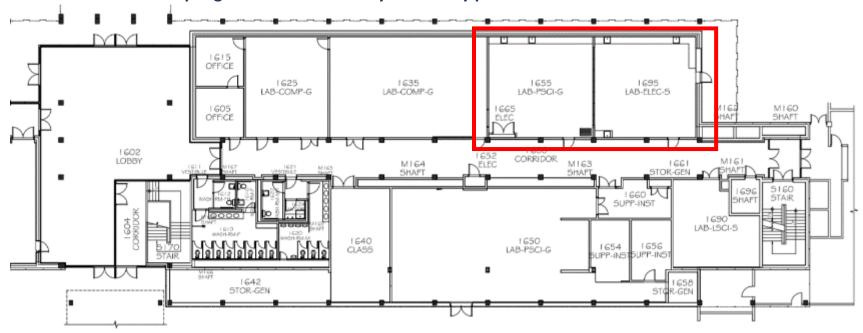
First floor of SW03. Red box highlights rooms addressed in this report
